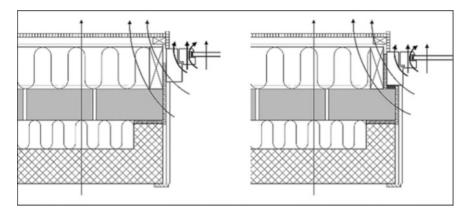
Example on how a window may be positioned in an externally insulated wall. Cold bridges are reduced by use of a thin insulation layer behind reveal linings and positioning the thermal glazing in plane with the additional insulation. To the right, the window is changed to a slightly larger one allowing more daylight. The arrows in the figure indicate the (reduced) energy loss at cold bridges. (Source: Nørregaard et al. 1984)
